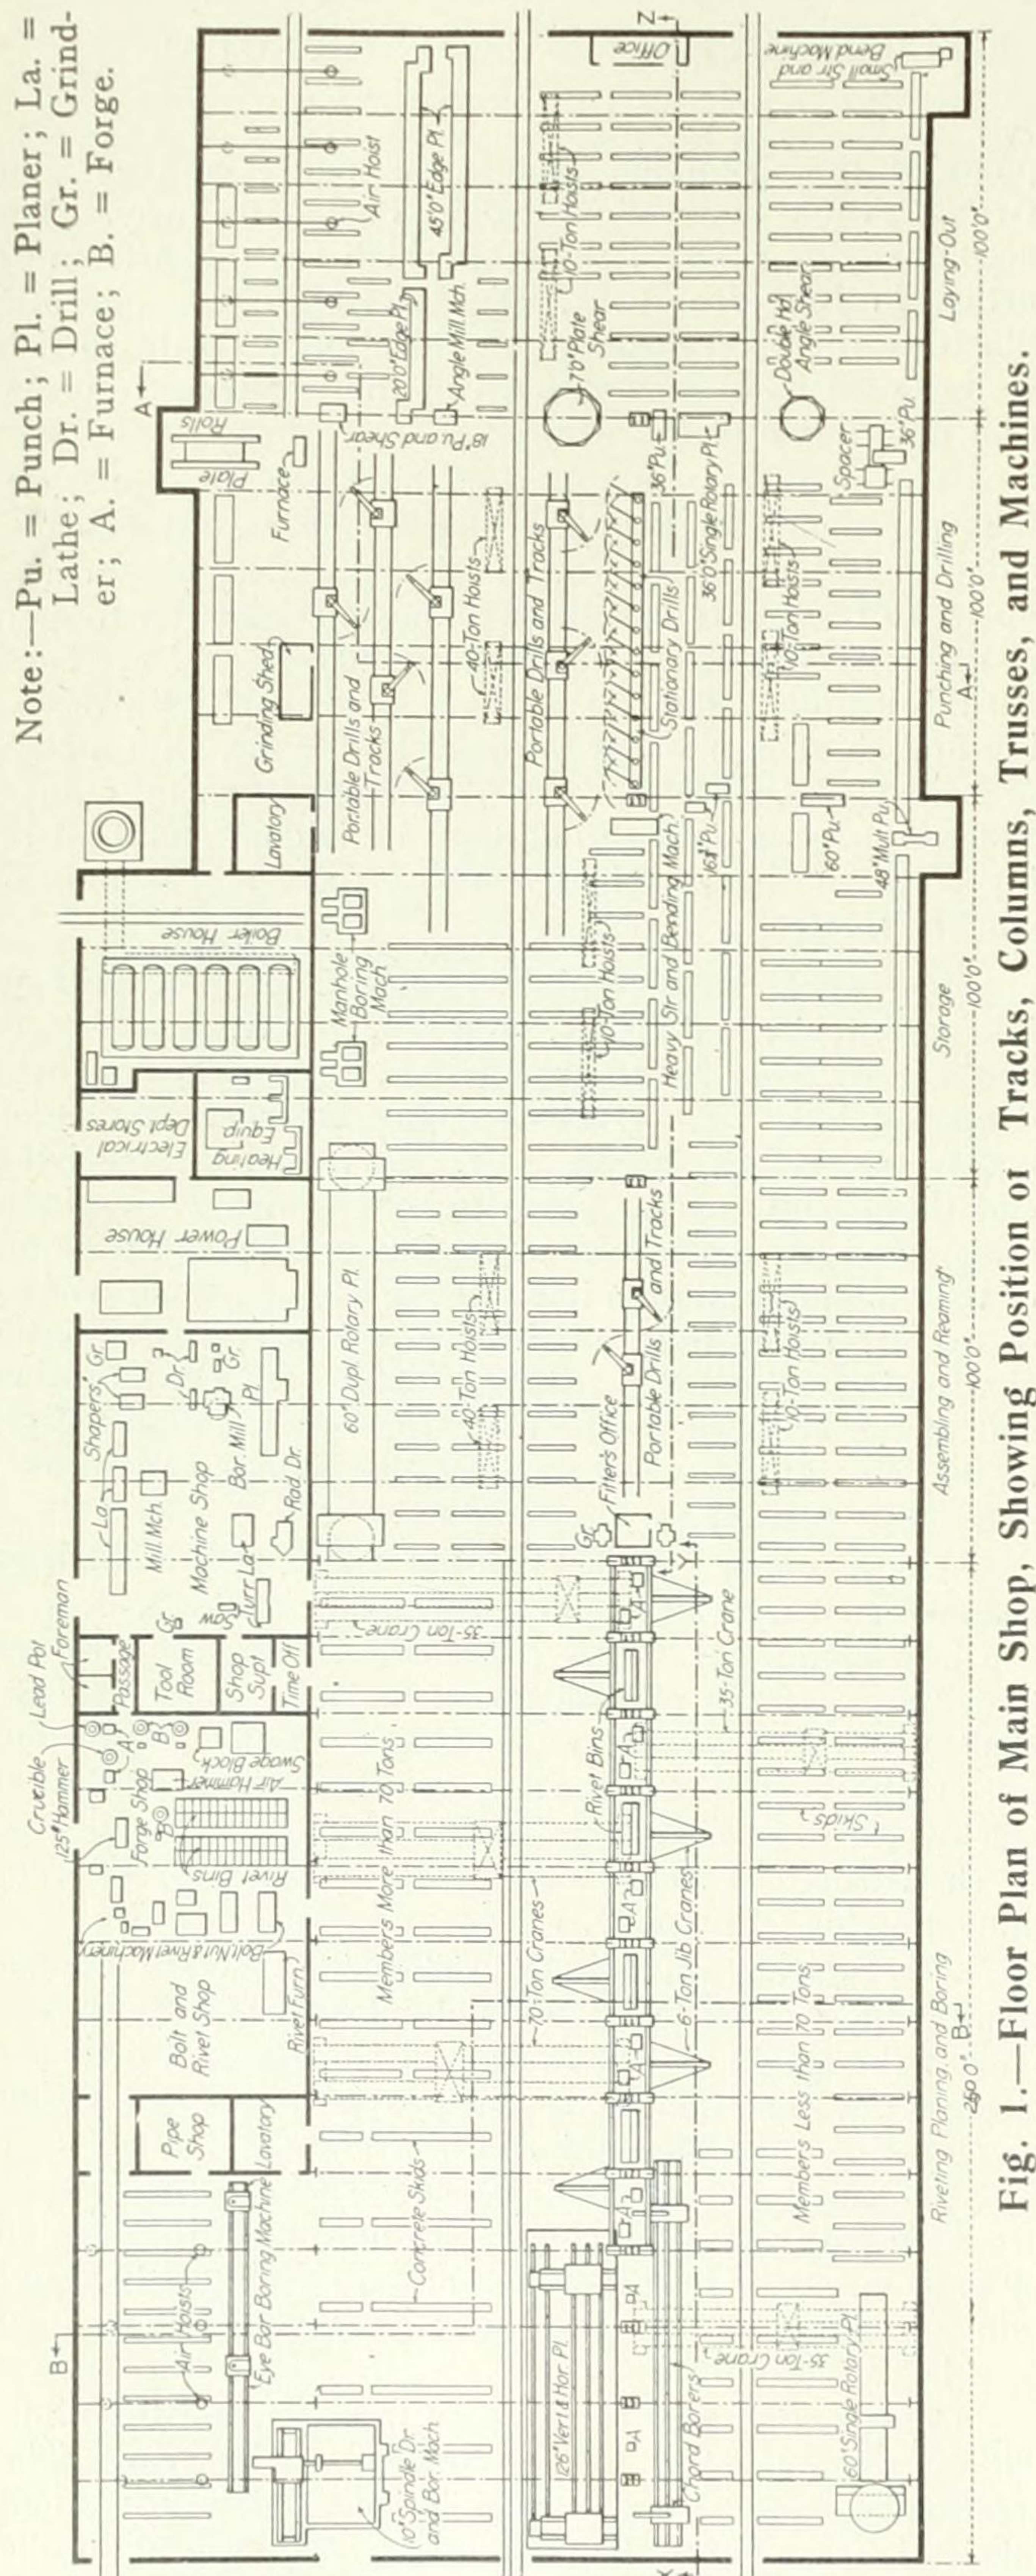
Floor Plan of Main Shop, Showing Position of Tracks, Columns, Trusses, and Machines.
